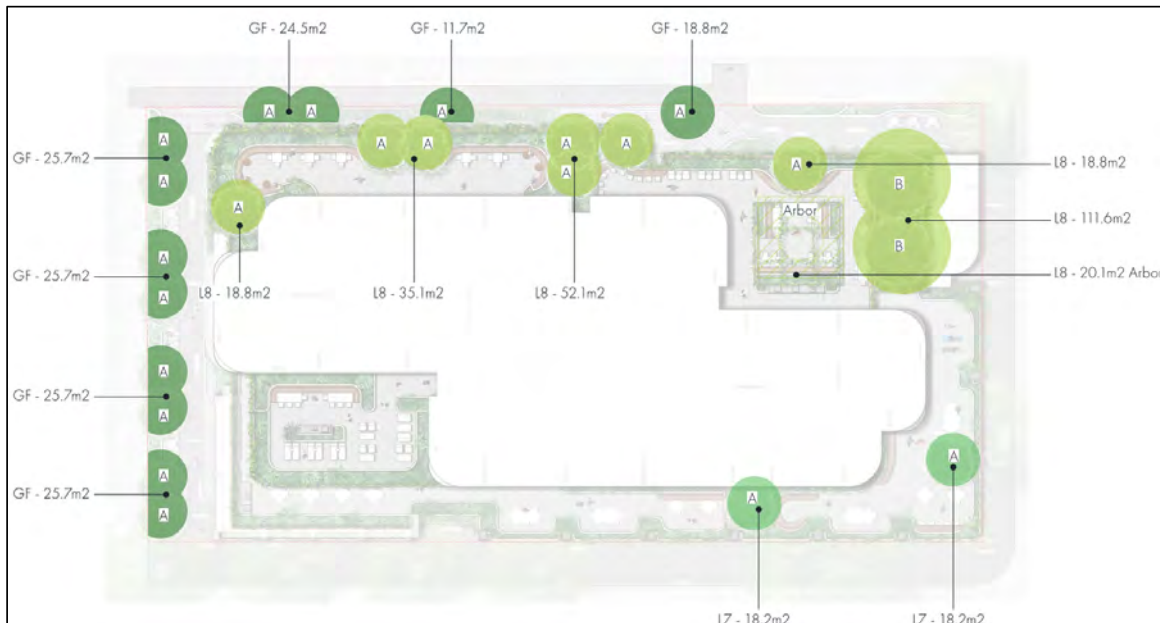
Extract from Landscape Concept Plan showing proposed planting in response to Standard D10 (Source: Applicant, June 2025)
